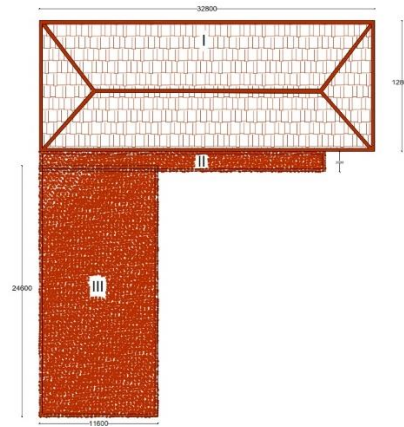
8 Layout of Khonsa Dormitory (Building *N*)
